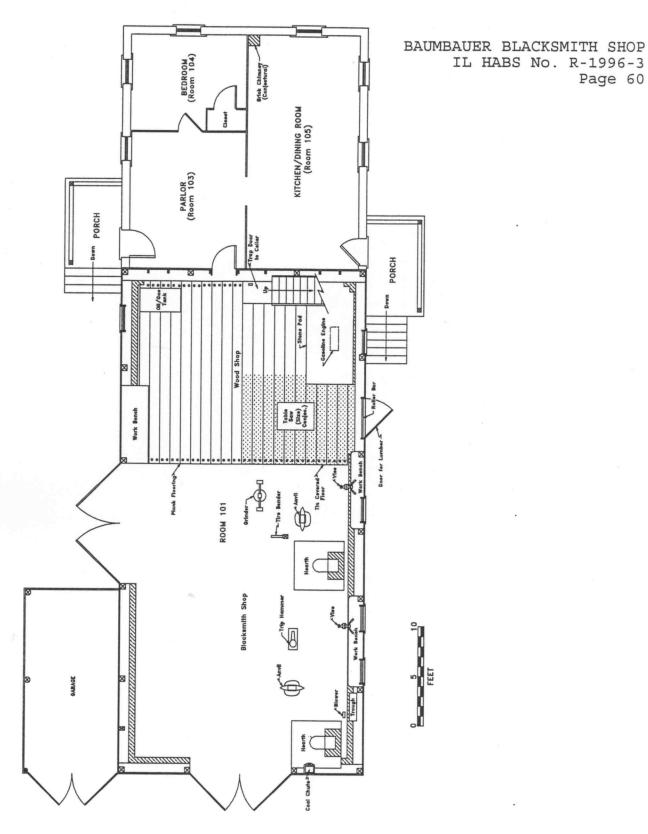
Ground floor plan of the Baumbauer Blacksmith Shop, showing conversion of rear addition into living quarters, ca. 1910.
